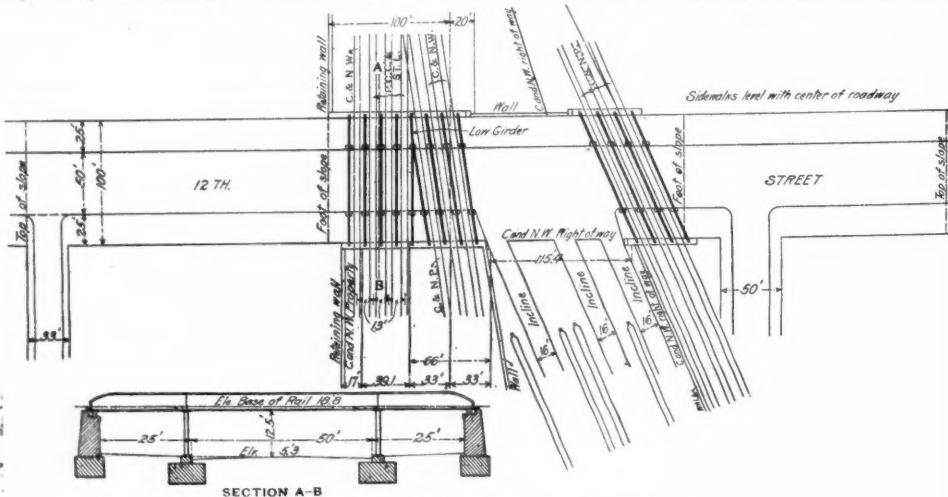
Street Plan of Subway—West Twelfth Street.
